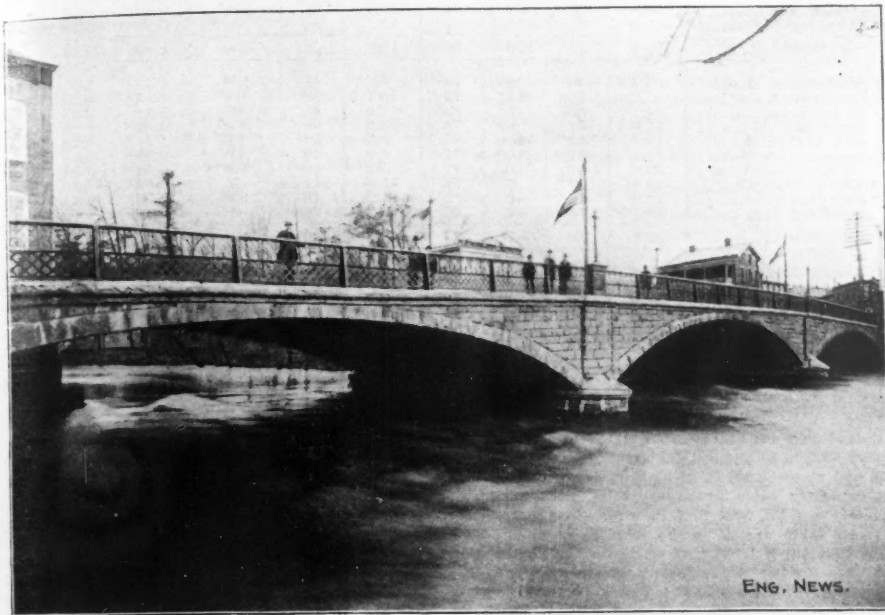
THREE-SPAN STONE FACED MELAN ARCH BRIDGE ACROSS THE PASSAIC RIVER, PATERSON, N. J.
